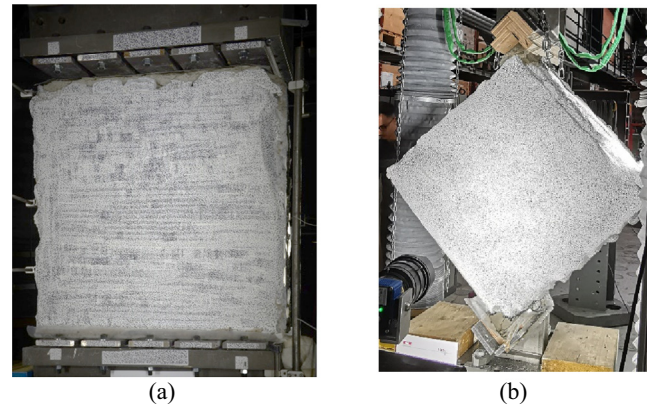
Tests on wallettes: (a) simple-compression test and (b) diagonal compression test. The images show the plastered side of the wallettes.
